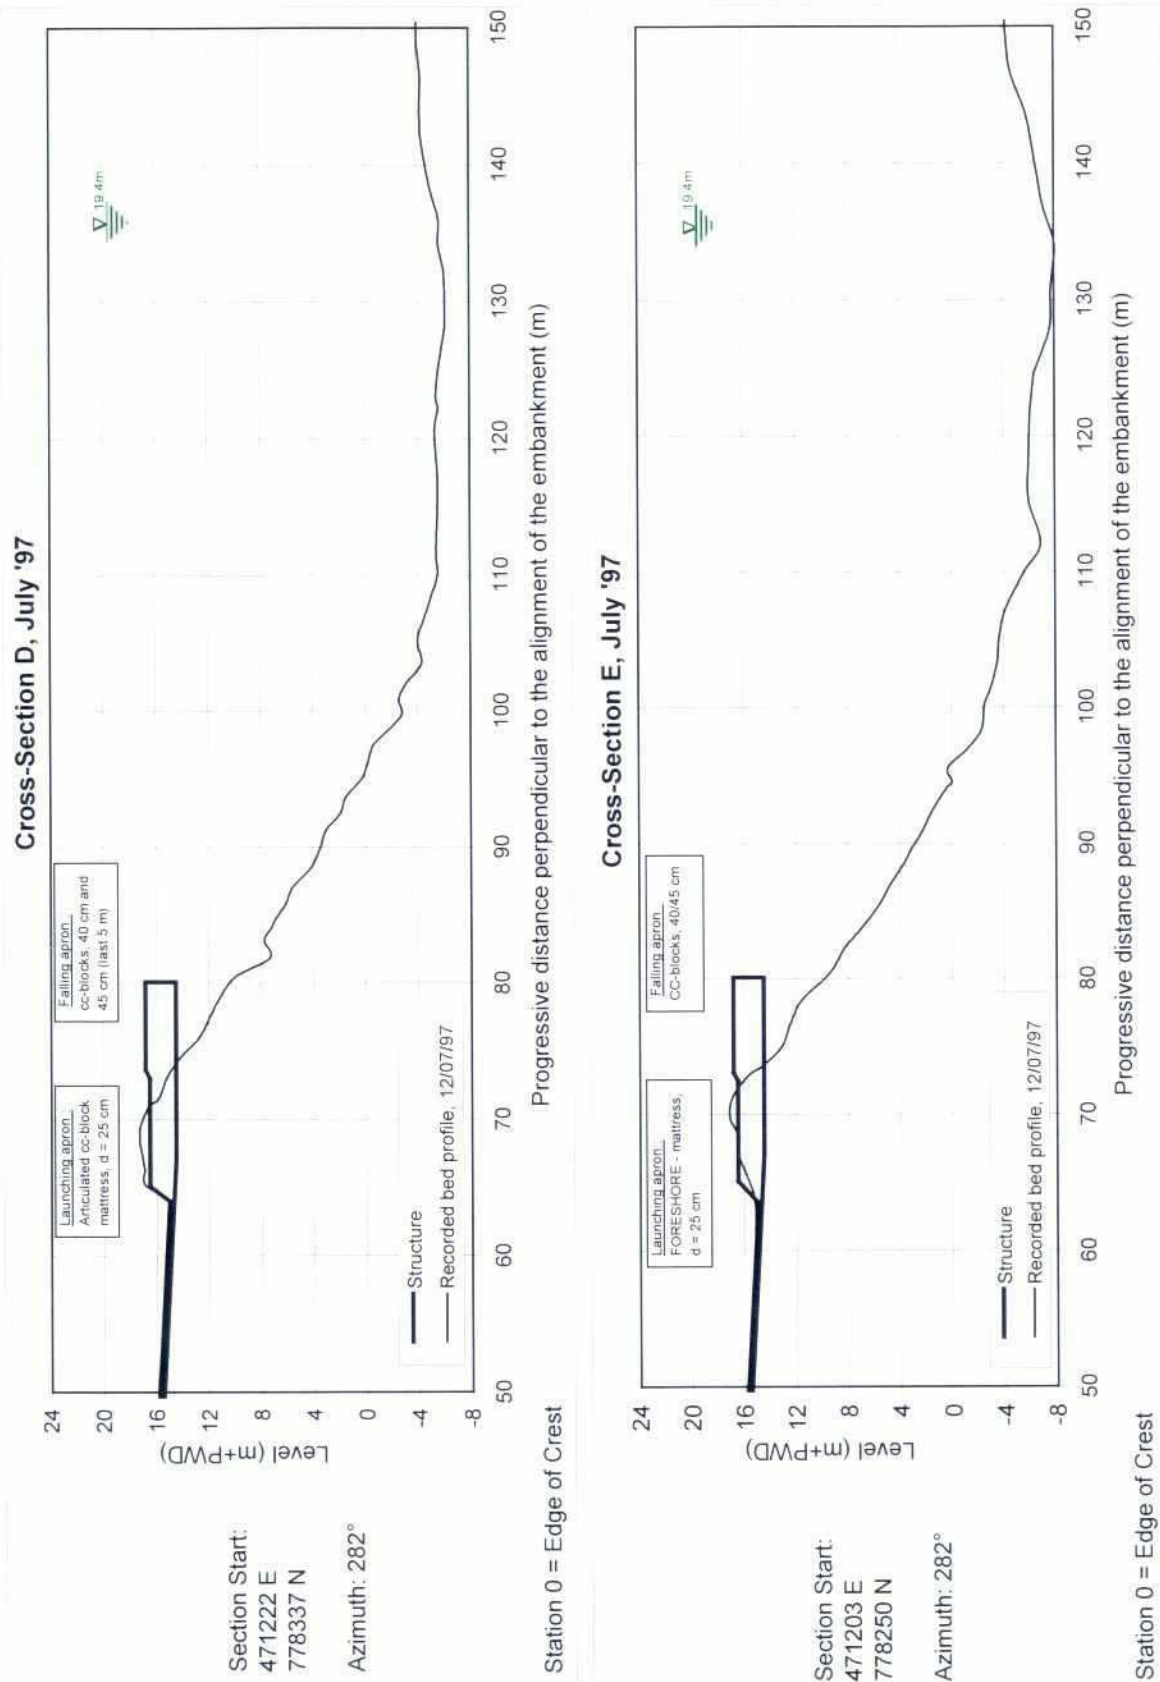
Steepest slope surveyed in Section D and E
